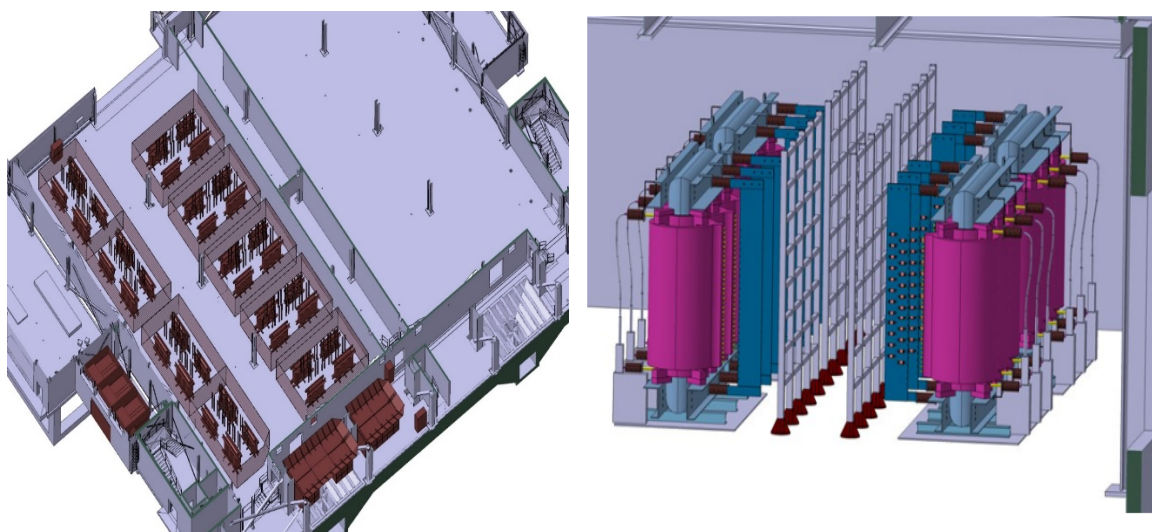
ICH&CD HVPS system layout at B15-L1
